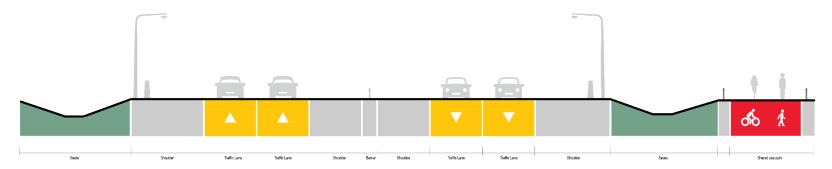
Indicative Alternative State Highway cross sections – West of North Auckland Line
